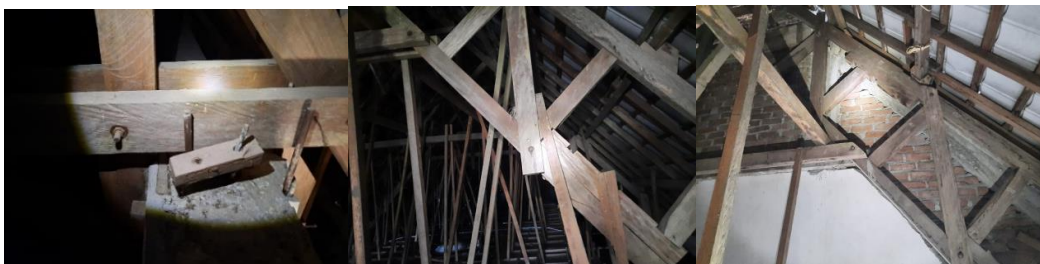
Insufficient Armature In Mounts, Joining Elements and Connector.
